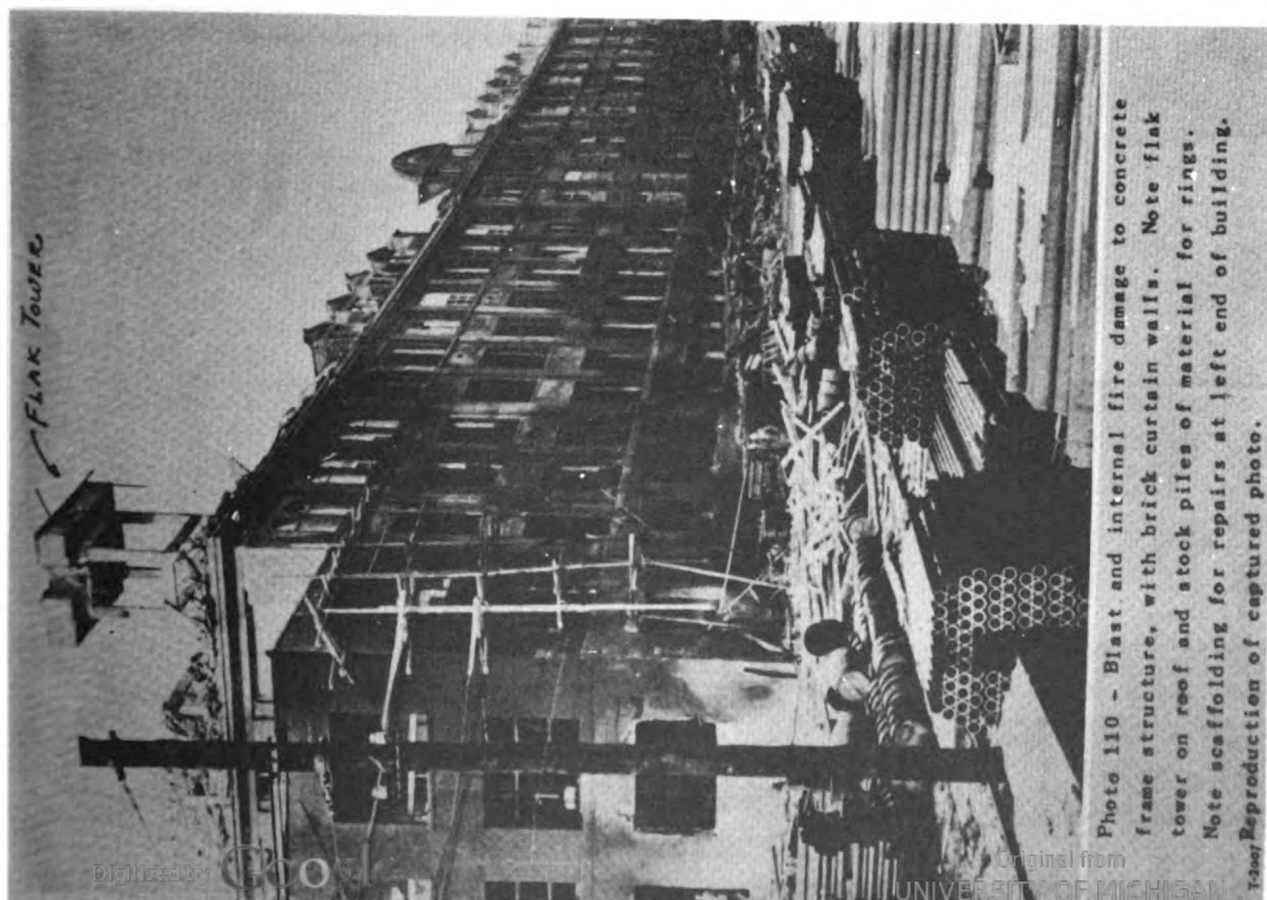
Blast and internal fire damage to concrete frame structure, with brick curtain walls. Note flak tower on roof and stock piles of material for rings. Note scaffolding for repairs at left end of building. Reproduction of captured photo.
